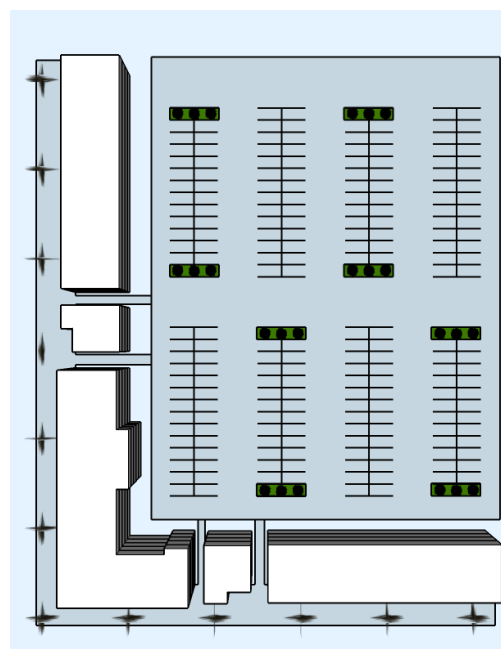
Traditional Downtown site layout with buildings brought to the edge of the sidewalk and parking in the rear.
